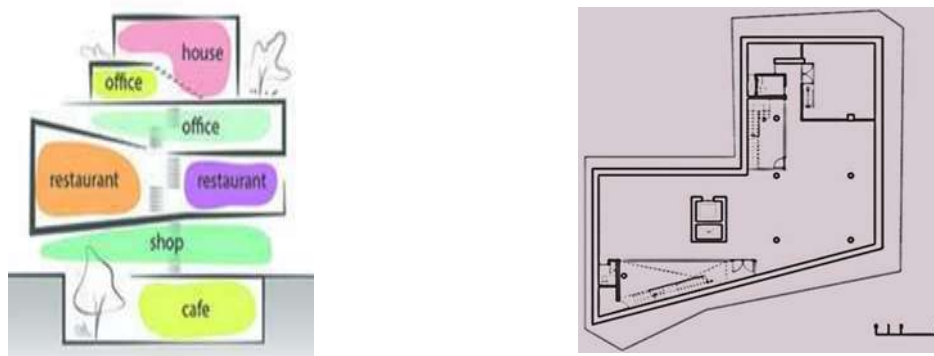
Floor plan and vertical section of Spacomex Complex South Korea
